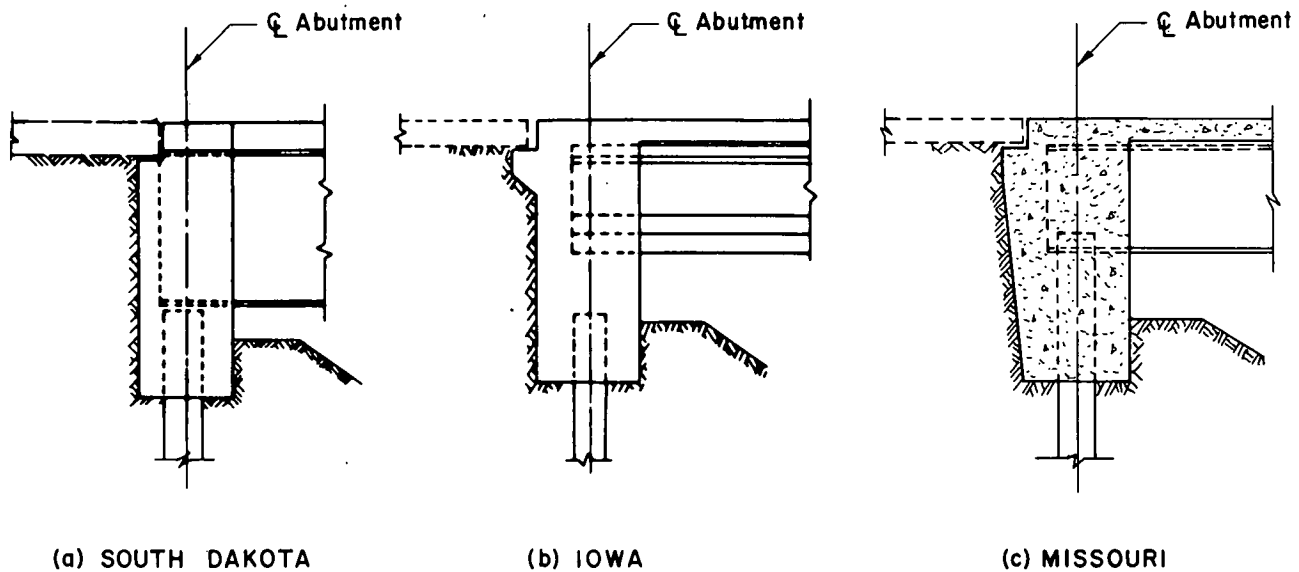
Integral abutments on flexible foundations. [Wolde-Tinsae et al., 1987]
